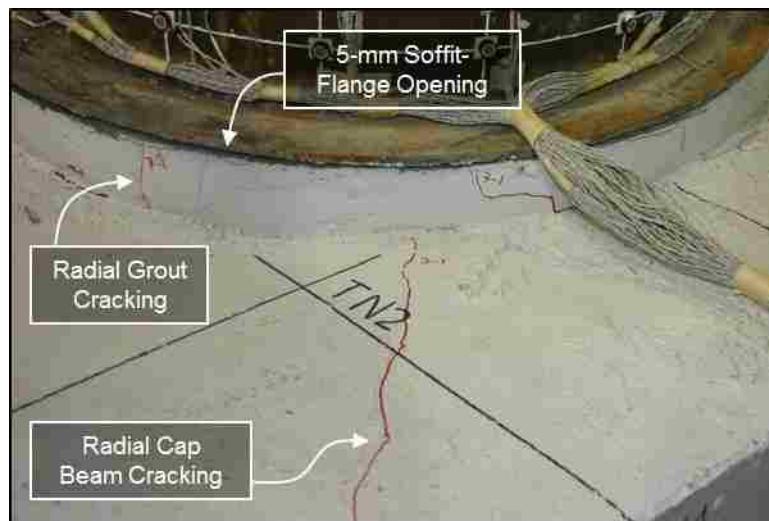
WRCUB North cap beam damage at 1.58% drift South
